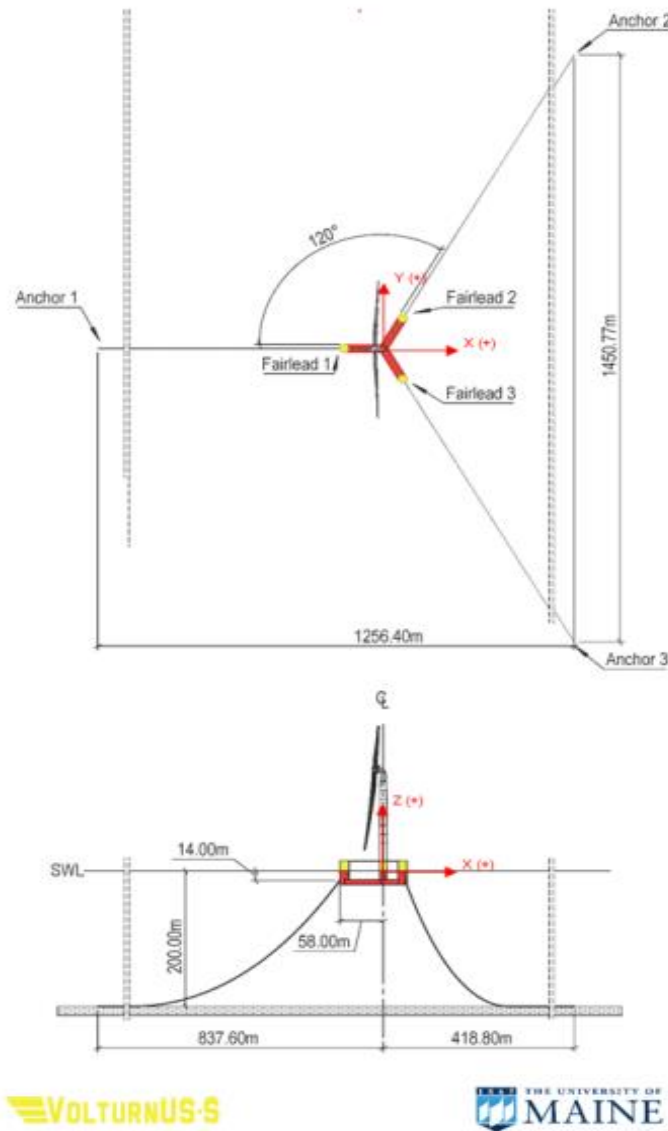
Plan (top) and elevation (bottom) views of the mooring system arrangement within the inertia frame. Figure courtesy of the University of Maine.
